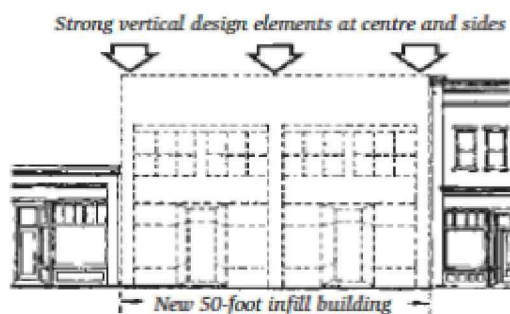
New storefronts should respect the existing pattern of building widths. A new infill building which is several lots wide should be designed to maintain the typical 30-foot-wide pattern of the PHA.
